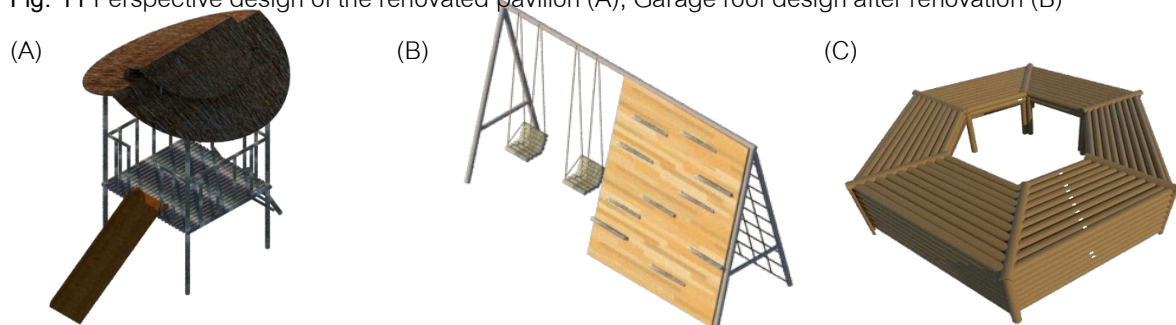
Perspective on the design of the children's play area after renovation (A); Children's swing design after renovation (B); Design of a seat surrounded by trees after renovation (C)
